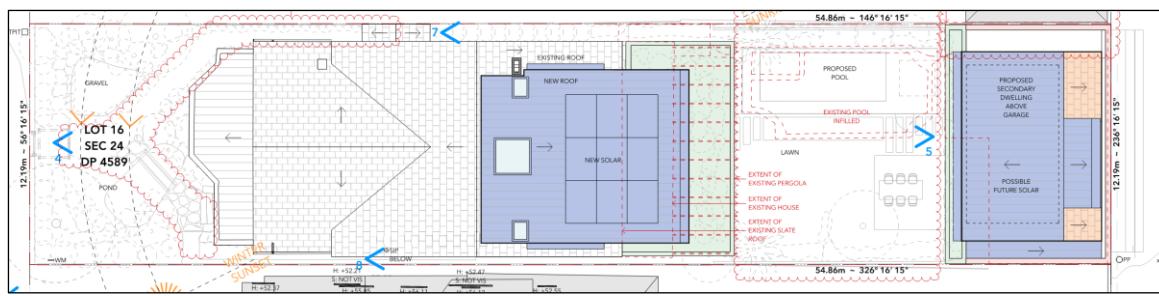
DA/165/2023/A – Approved site plan (source: DA/165/2023/A)
